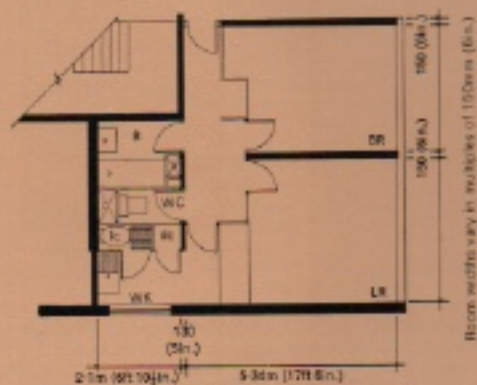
An alternative arrangement to give two bedrooms, study and living room. The wall between the kitchen and study can be omitted or removed later in order to provide a large dining kitchen. As a further alternative the structural wall can be between the kitchen and study so that the partition could be removed to give a larger living room.
